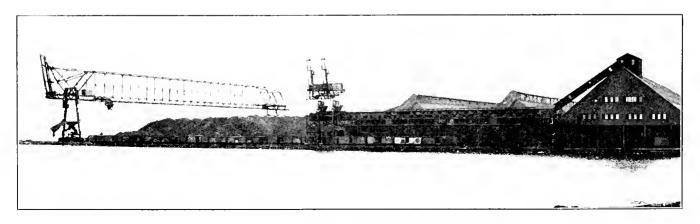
North Western Fuel Company's Dock No. 1, Superior, showing Anthracite Section and Largest Coal Handling Bridge installed to Date
